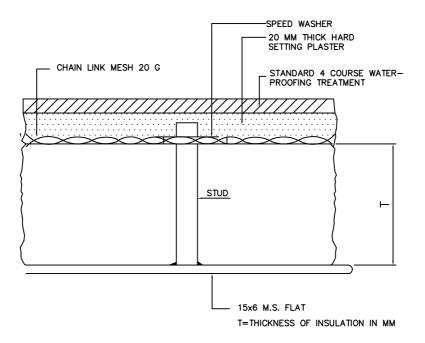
DETAILS OF TANK TOP SETTING PLASTER FINISH
